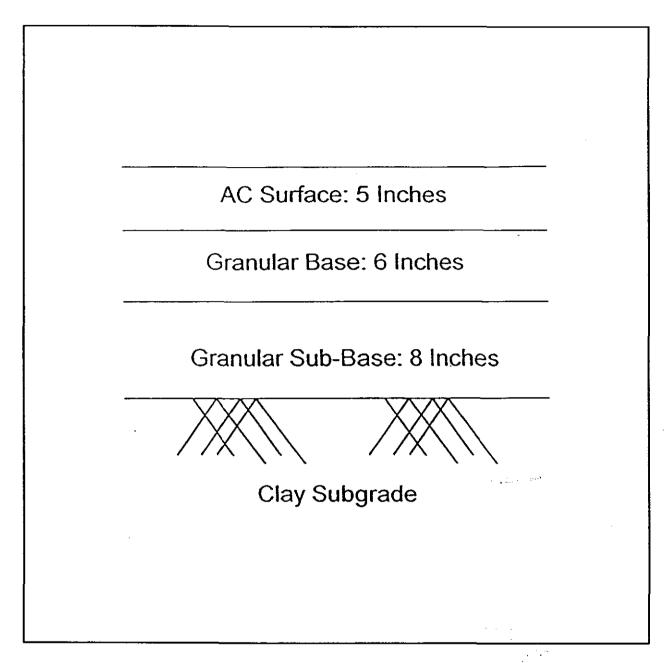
Cross-Section of typical flexible pavement section in South Dakota
